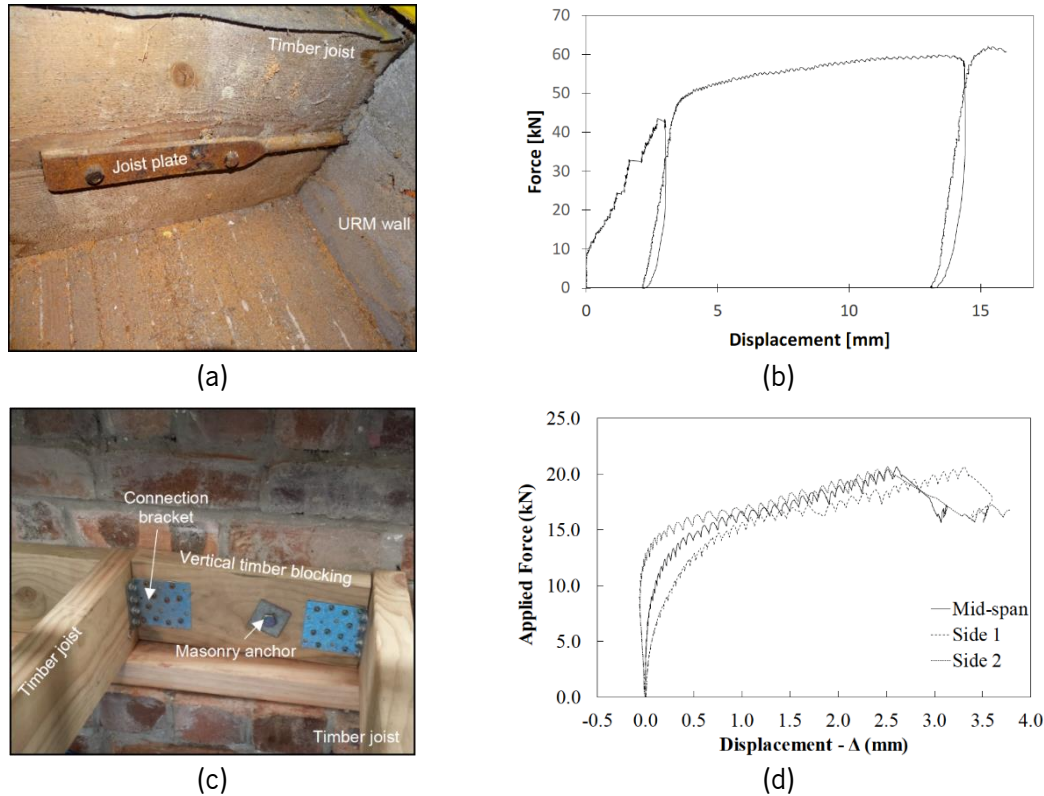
Wall-to-diaphragm experimental tests by Dizhur et al (2018) : (a) joist plate connection; (b) joist plate connection exhibiting anchor rod rupture; (c) timber blocking connection; (d) vertical timber blocking connection exhibiting screw withdrawal.
